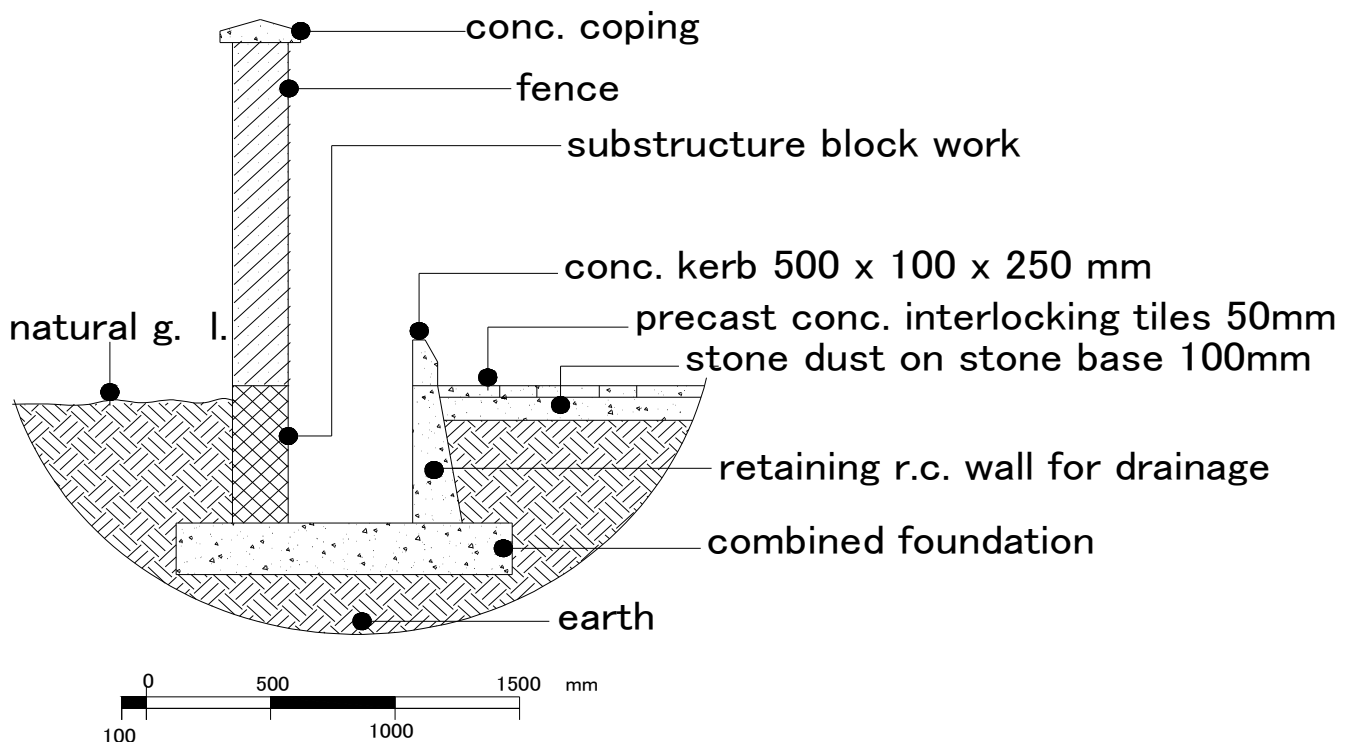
Section through the Combined Foundation base, Fence, Drainage Channel and retaining wall Source: author's design.
